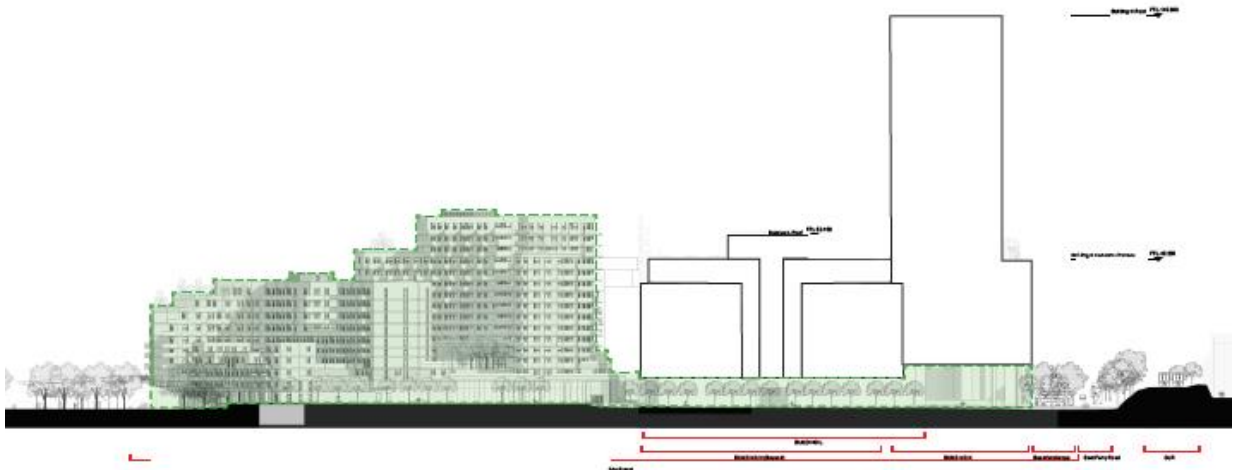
Northern elevation with detailed and outline components (from Parameter Plans)
